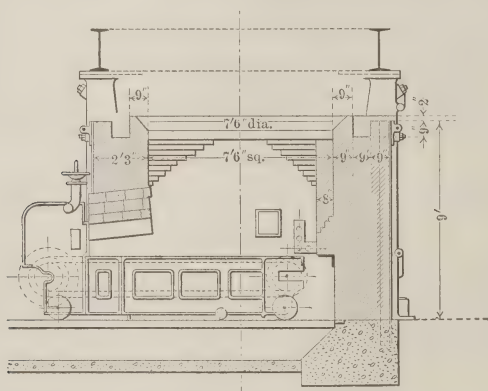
SECTION OF FURNACE OF THE BOILER SHOWN ON PAGE 279
